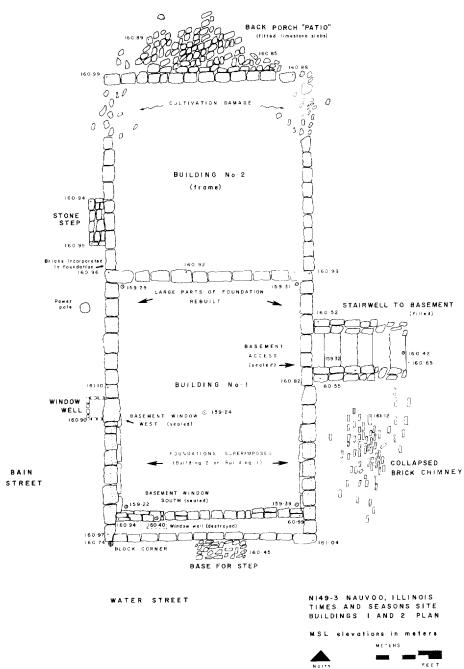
Buildings 1 and 2; Plan. Elevations are in meters MSL.
